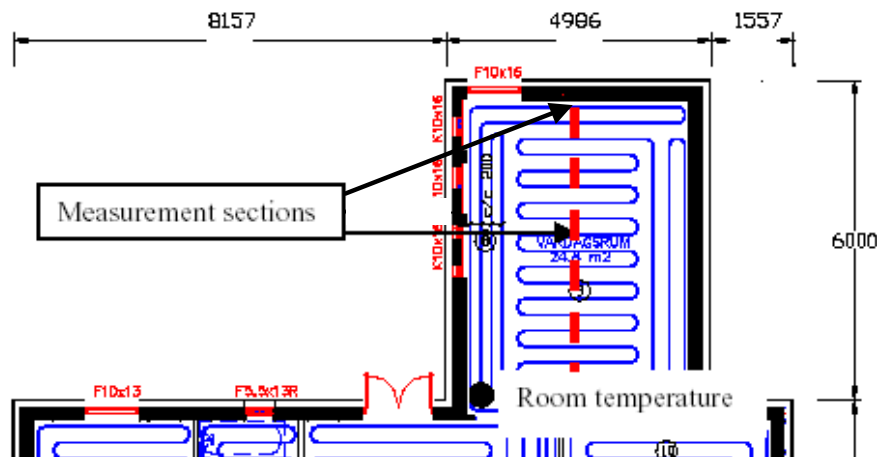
Partial floor plan of the house in Bromölla. The measurements are carried out in the appendix to the main house.
